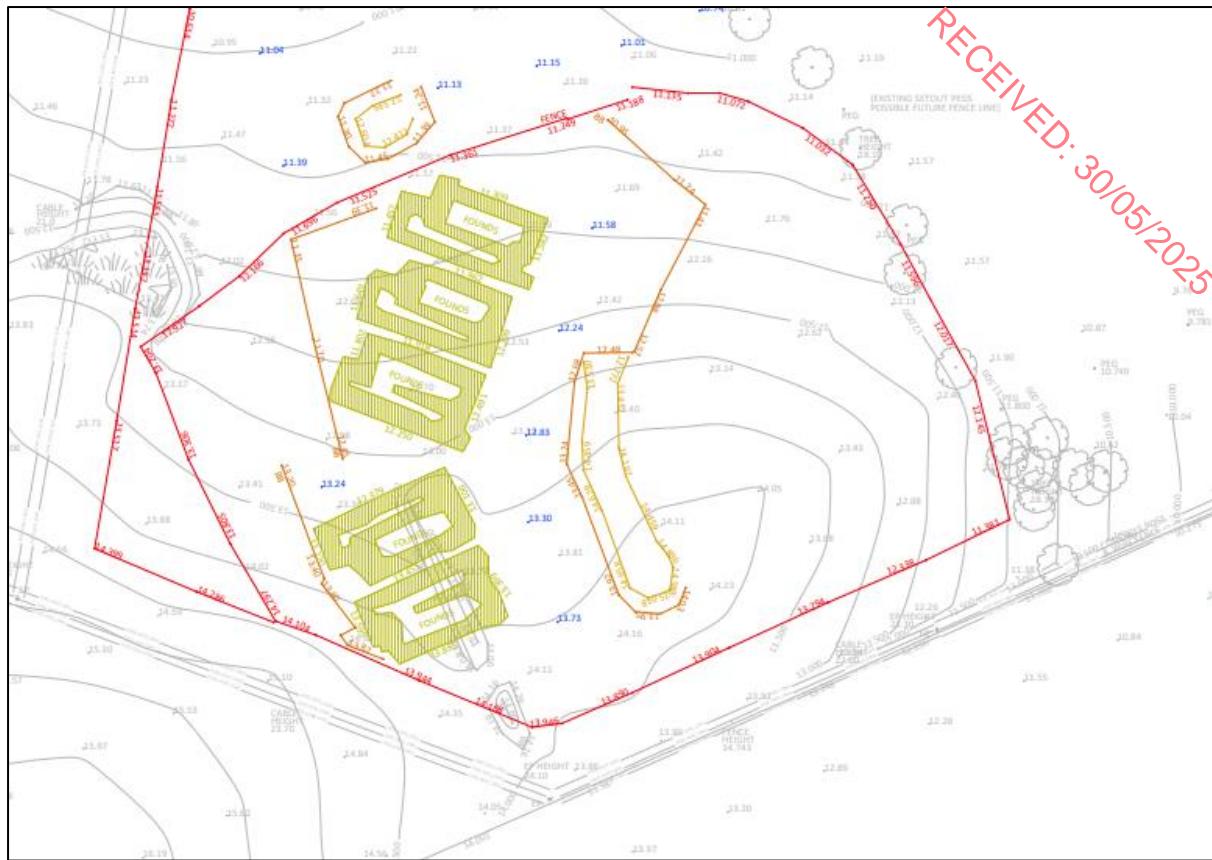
Existing Foundations at South East corner of Principal Site area (Extract from Topo Survey)
